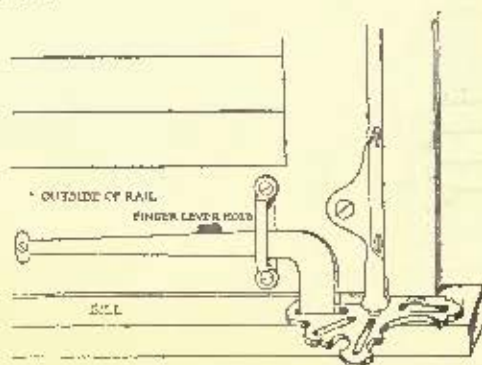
Tenon Blind-fastener. Tenon Fastener Co.
